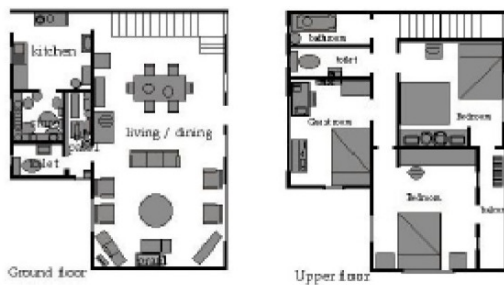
Example of floor plan and façade of a Tenement house. (Source: Adekun 2007)
